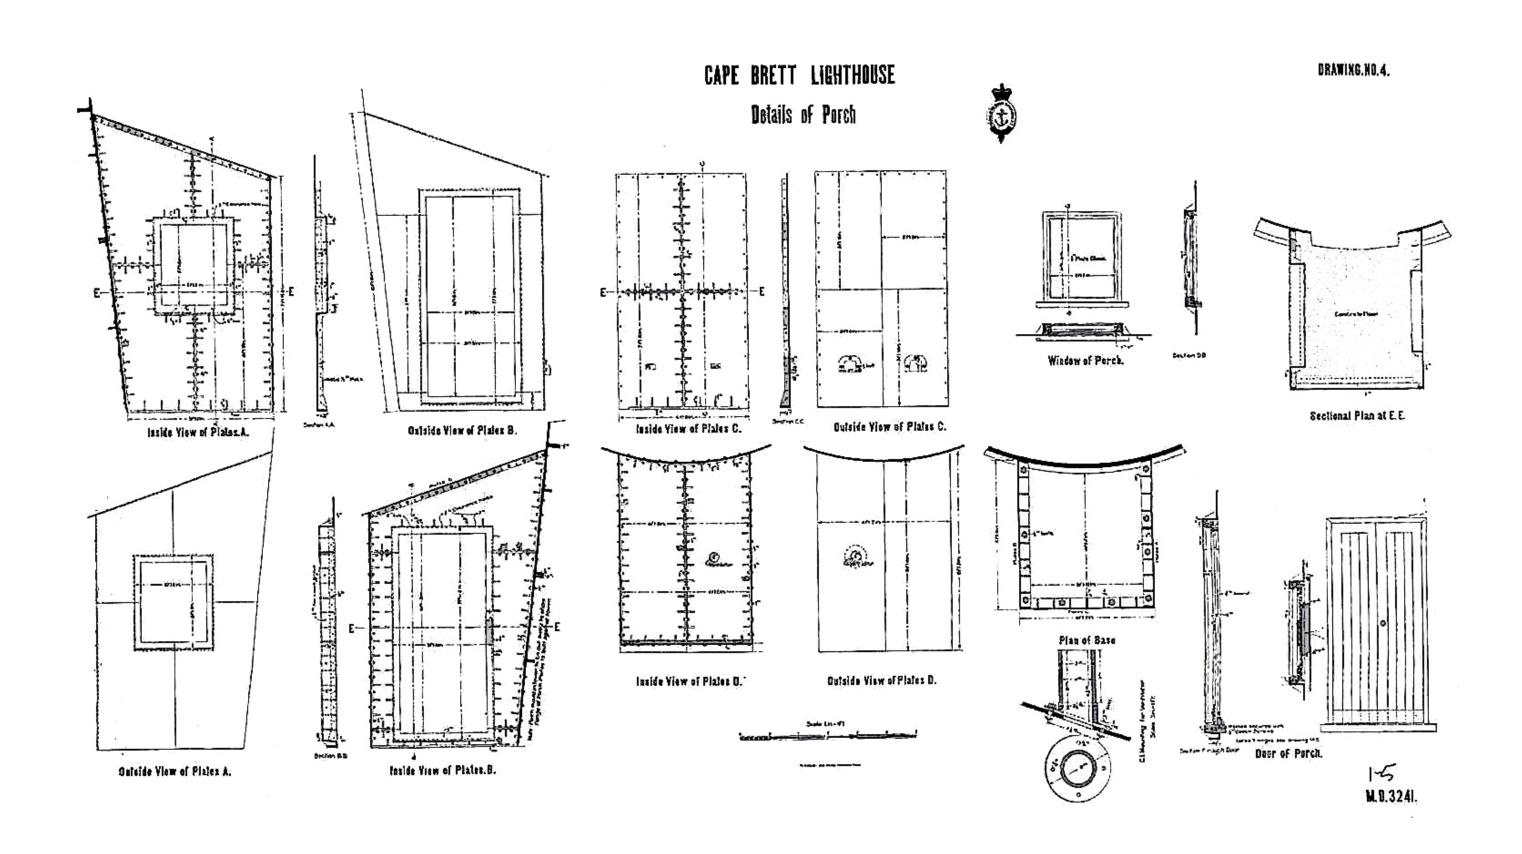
The architectural plans for the lighthouse –Drawing No 4.
